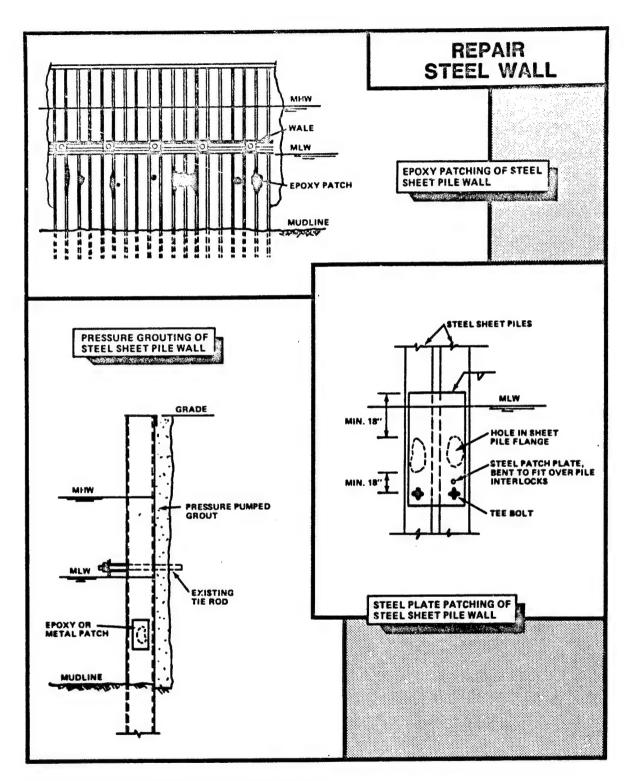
Repairs to Steel Sheet Pile Walls Using Various Patching Techniques.
